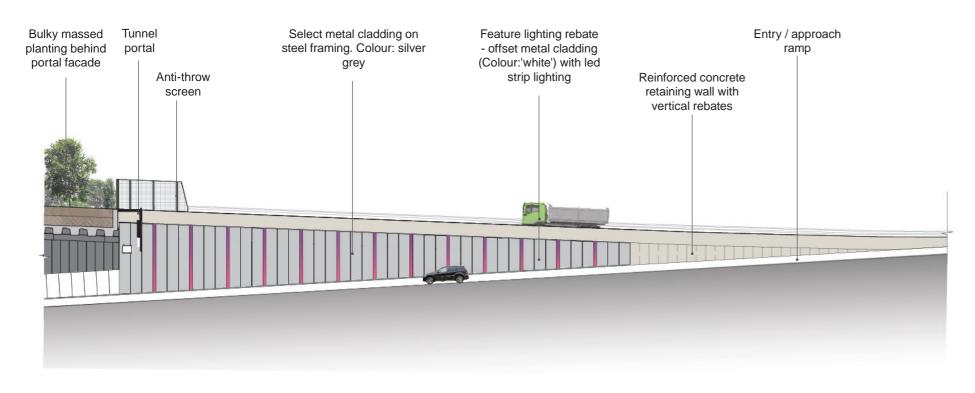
M4-Anzac Entry Portal - dive wall elevation - motorists side
